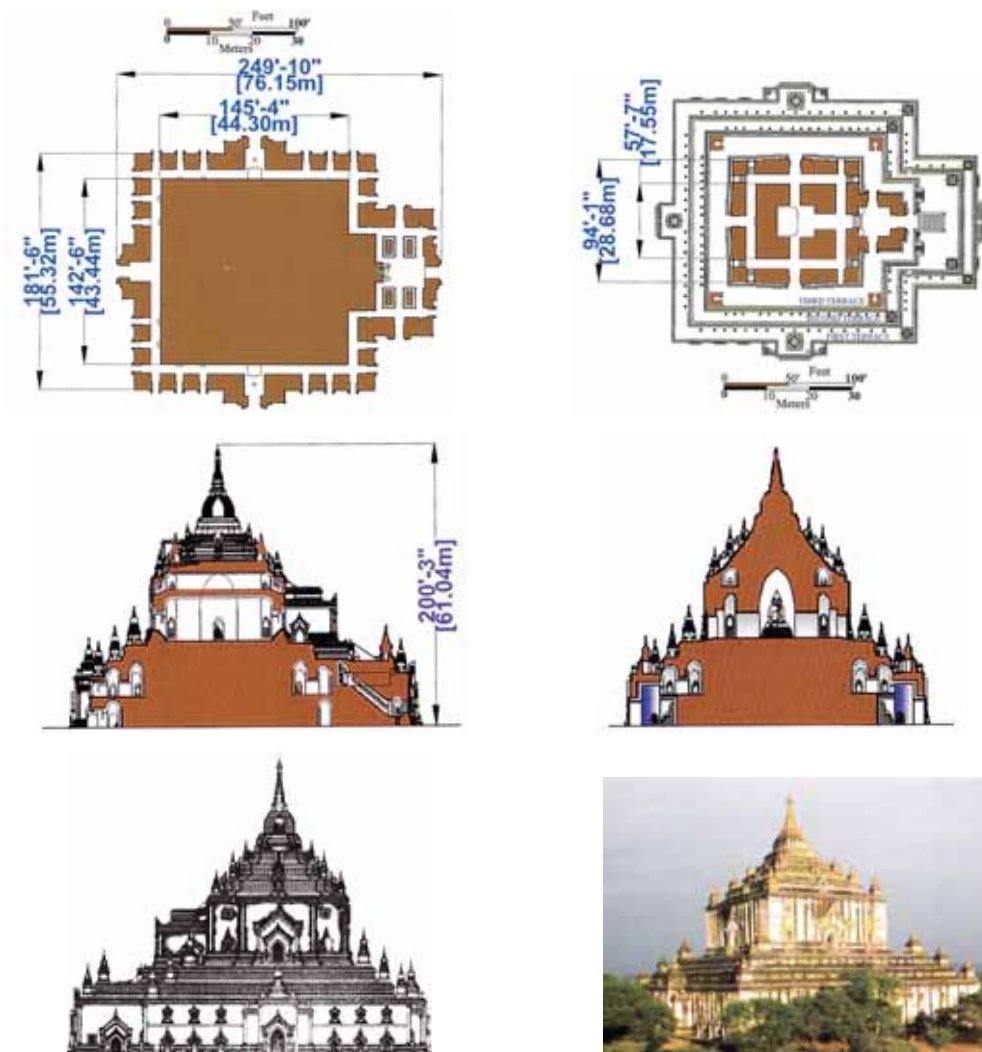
Ground floor plan, section and elevation of That-Byin-Nyu temple
